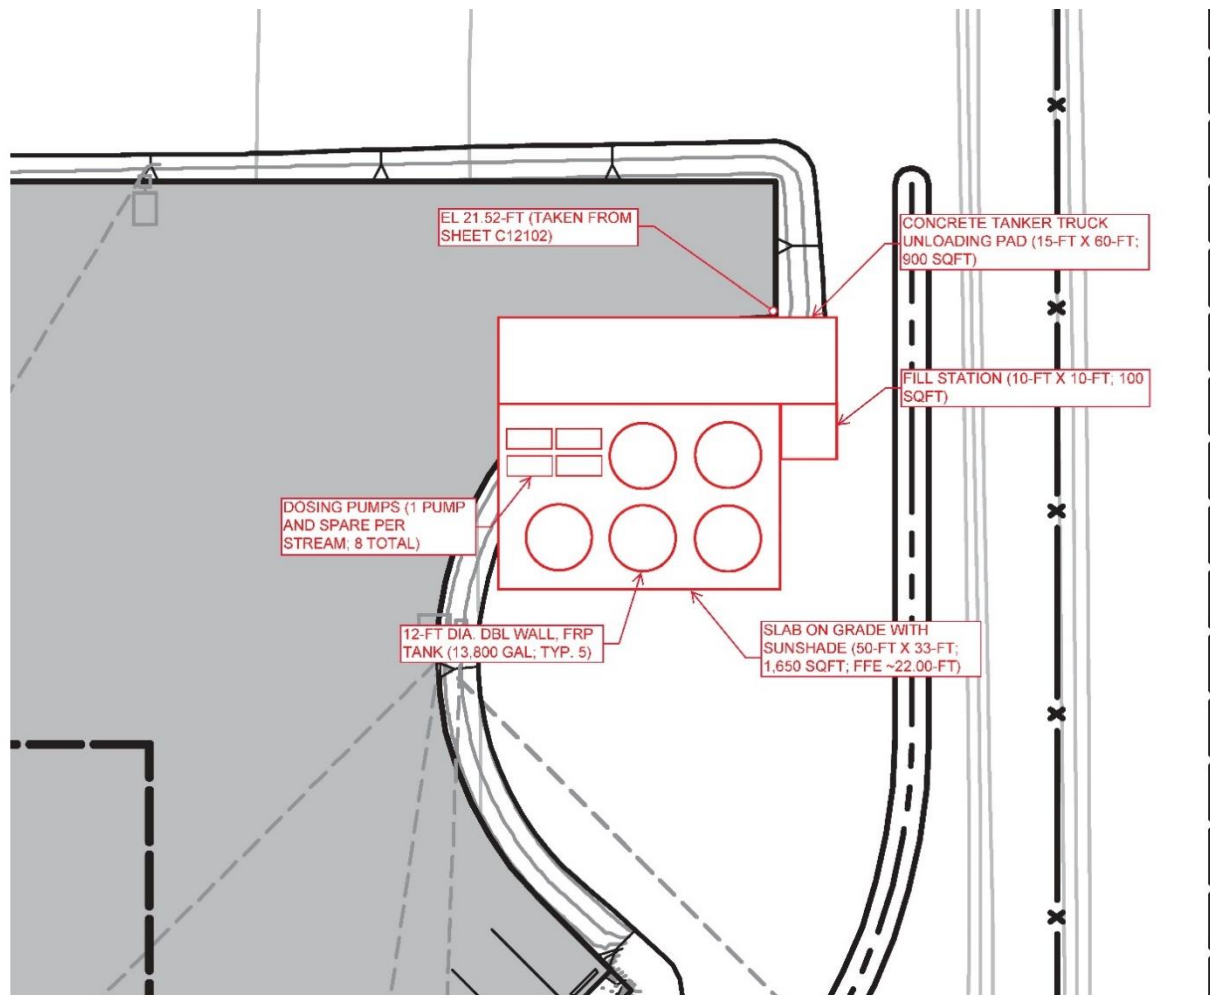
C-43 Inline Alum System Conceptual Layout Plan
